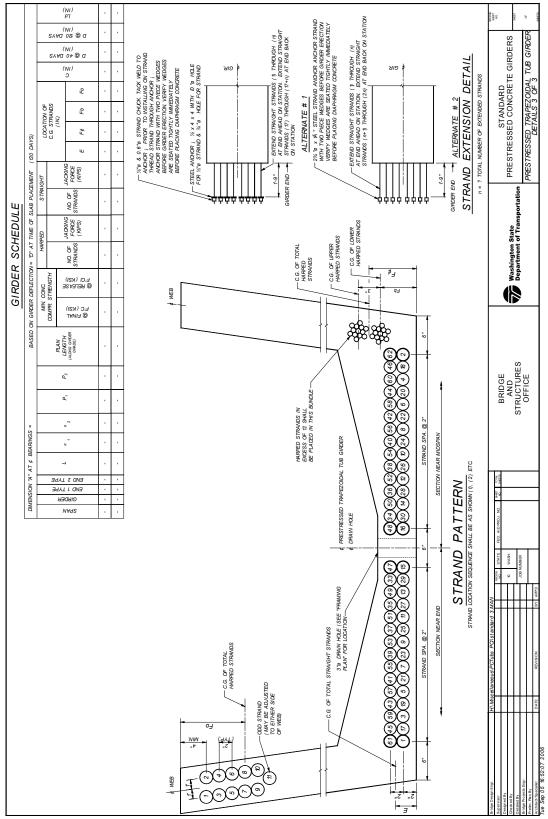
Standard Drawing for Trapezoidal Tub Girder, 3 of 3
